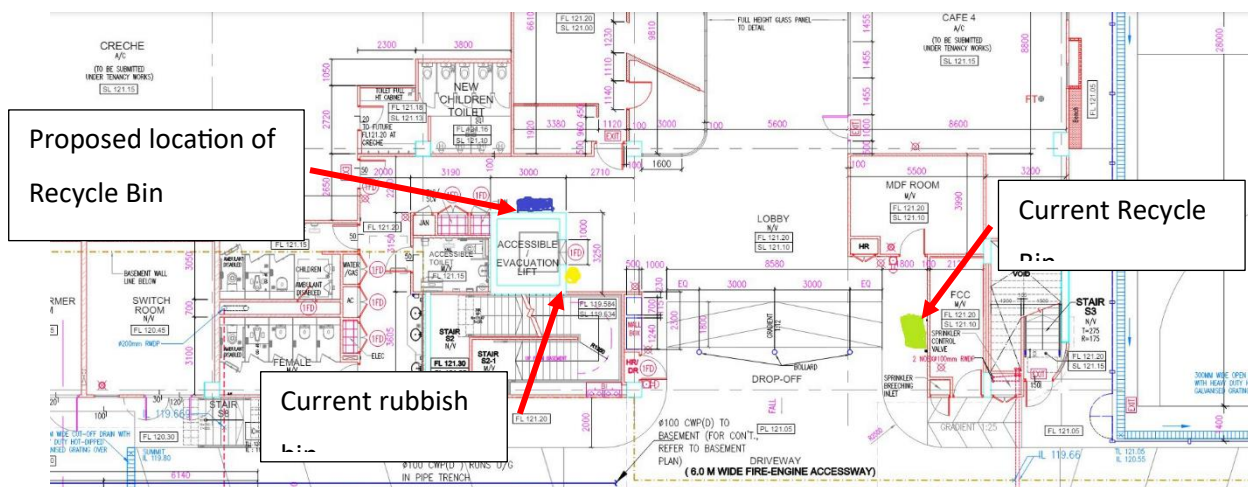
Floor plan of Hillview Community Centre showing locations of bins
